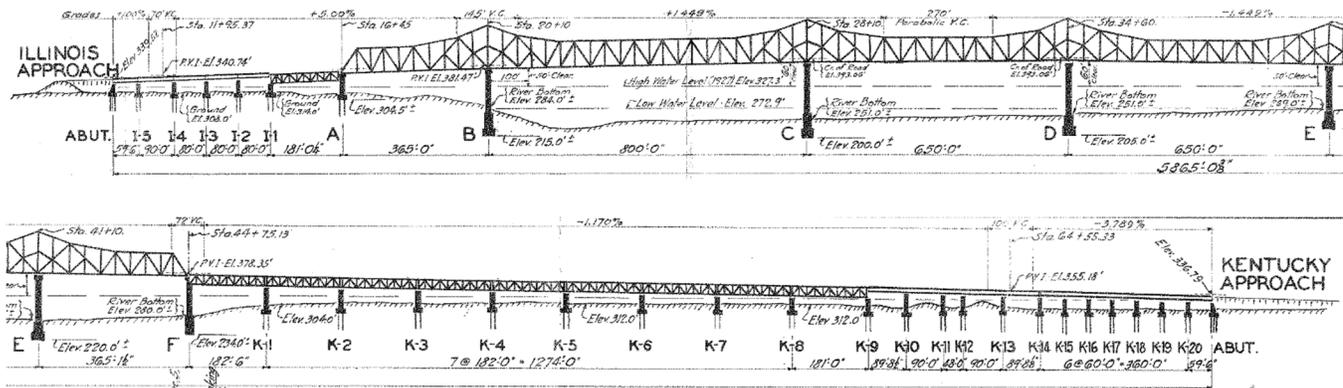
As Built Profile of Existing US 51 Bridge (Cairo Ohio River Bridge)
